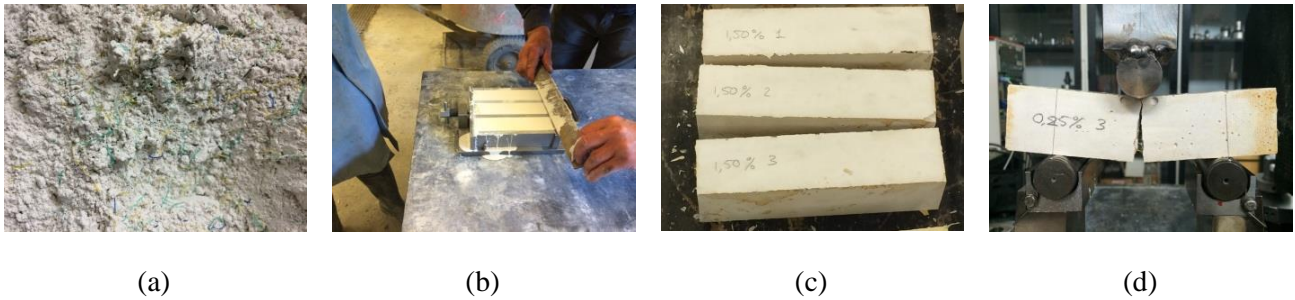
Example of the preparation and test procedures for the three-point bending tests shown for gypsum-based specimens. a) Mixing raw materials and R-PE fibres; b) casting specimens in steel moulds; c) specimens after curing; d) and three-point bending testing
